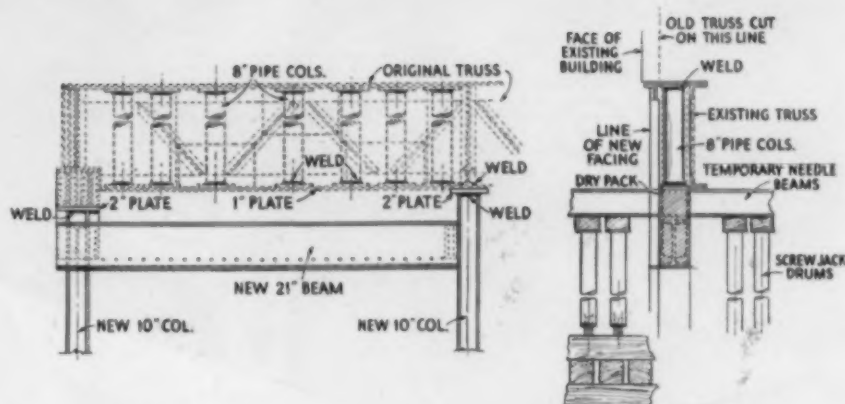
Front view and cross-section showing alterations made in order to set wall back.
